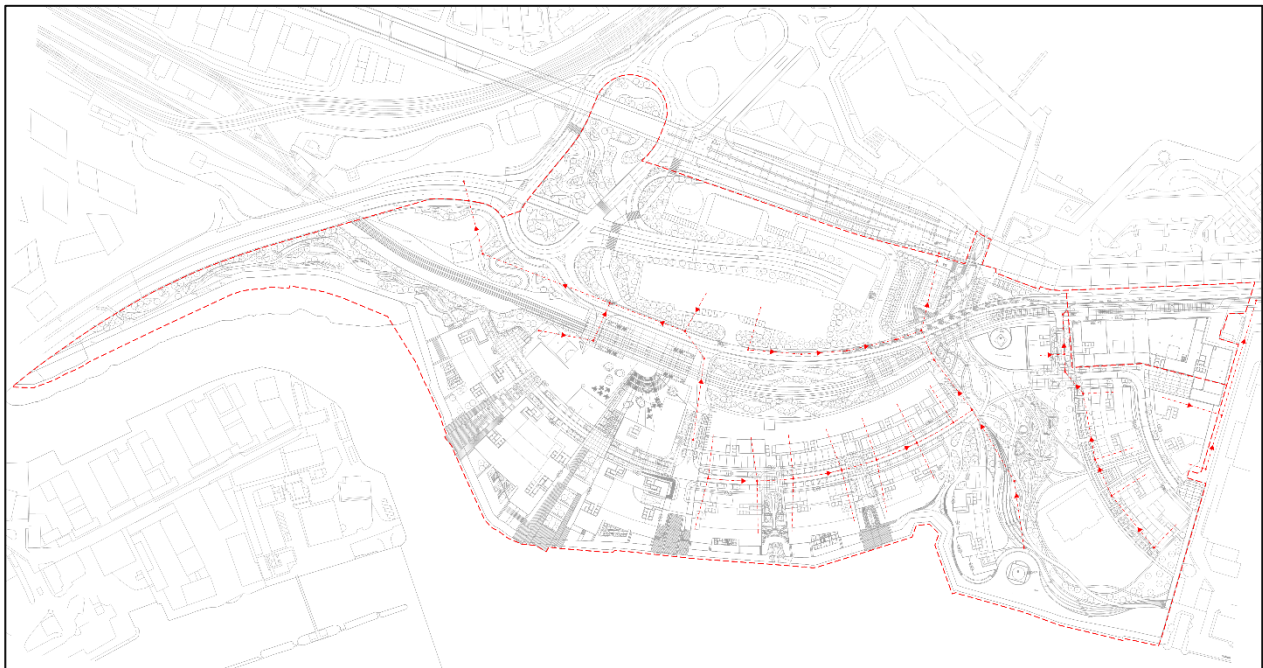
Plan showing the overall proposed foul water drainage strategy
